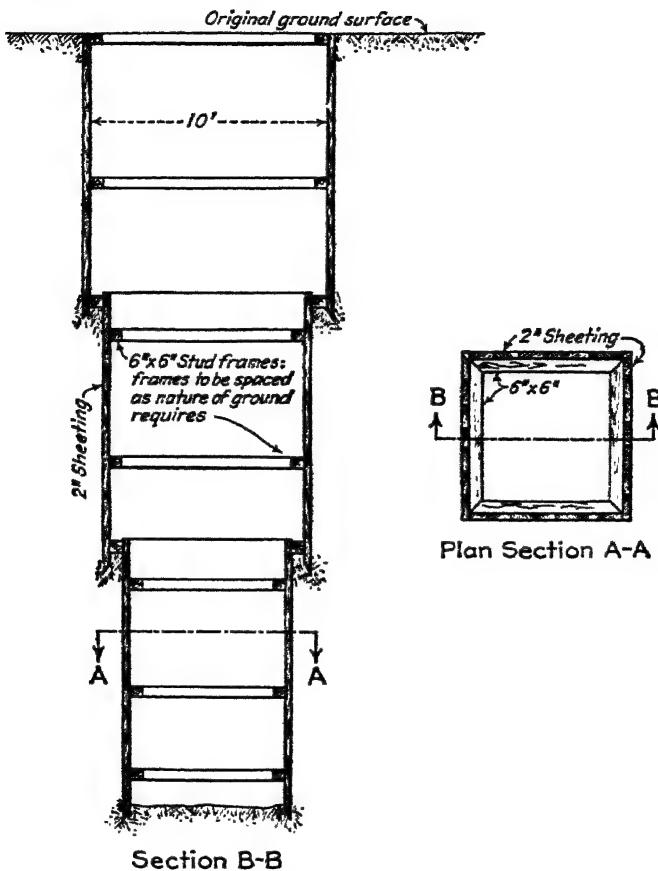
Test pit showing arrangement of timbering and sheeting. Note method of pointing sheeting to prevent crowding in of pit.
